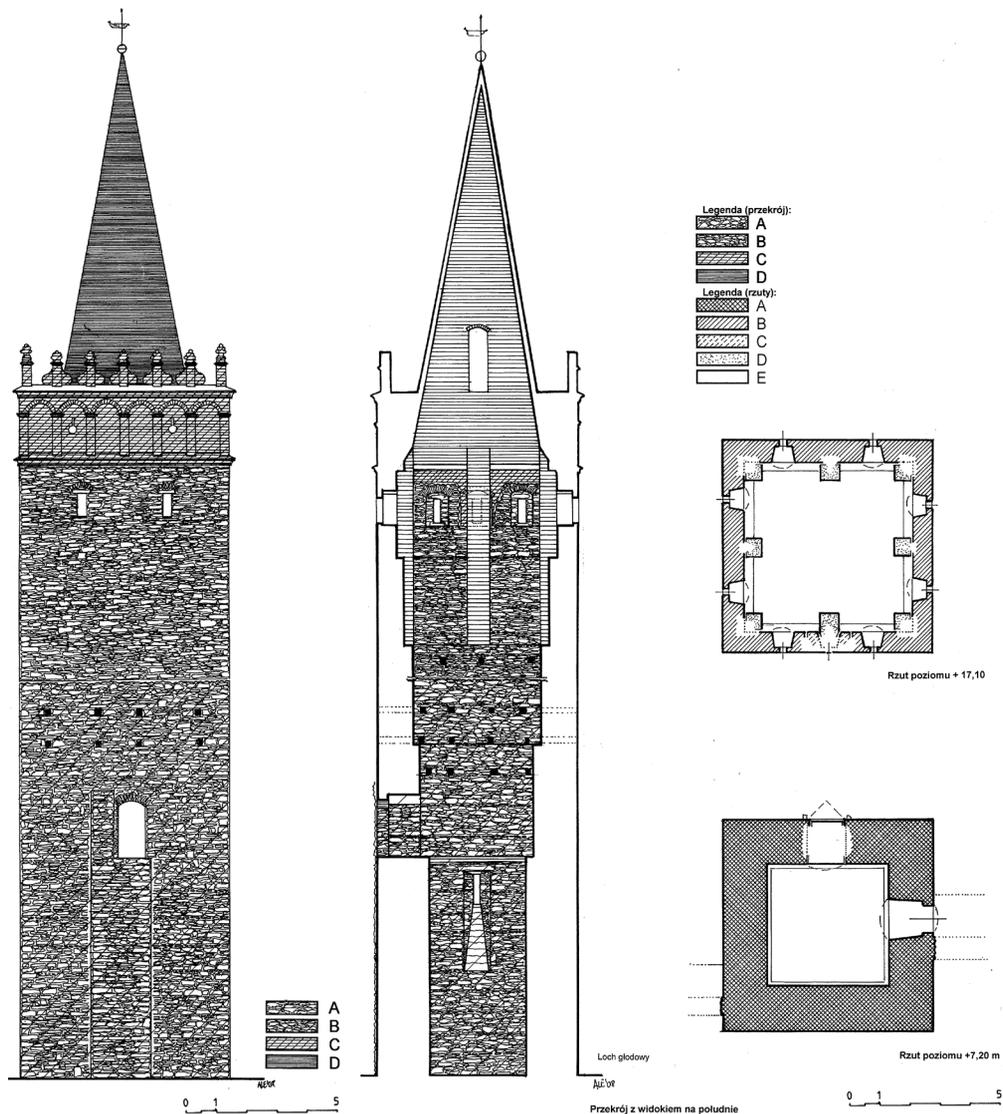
Glucholazy, Górna Gate's tower, east elevation, cross-section with a view to the south and projections with chronological wall stratification. Elevation and section. A – 1st half of the 14th century, B – 2nd half of the 15th century; C – around 1600; D – between 1898–1902; projections Signs: A – 1st half of the 14th century; B – 2nd half of the 15th century; C – around 1600; D – between 1898–1902, E – unrecognized walls (drawn by A. Legendziewicz)
